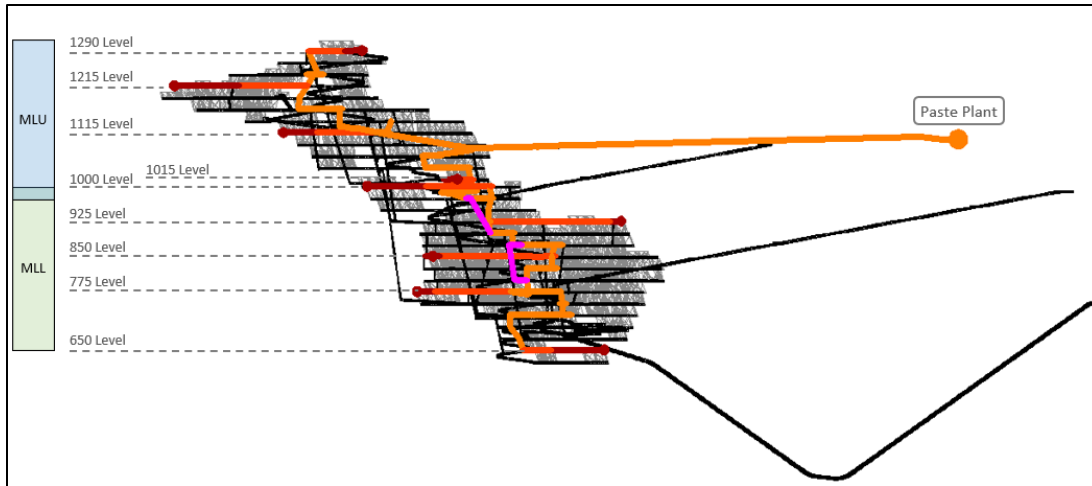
Underground Distribution System – Long Section (Looking South)
